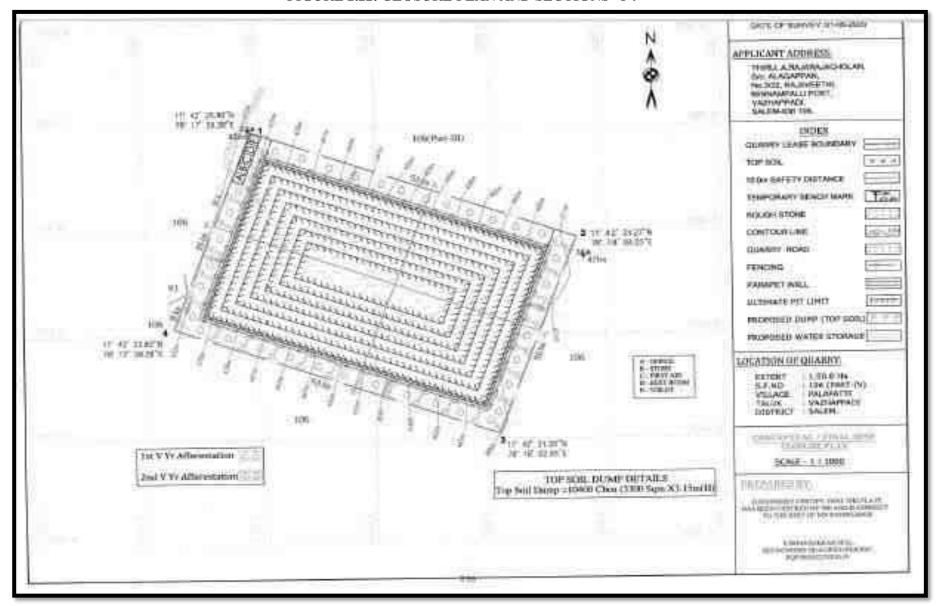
CLOSURE PLAN AND SECTIONS "P4"
